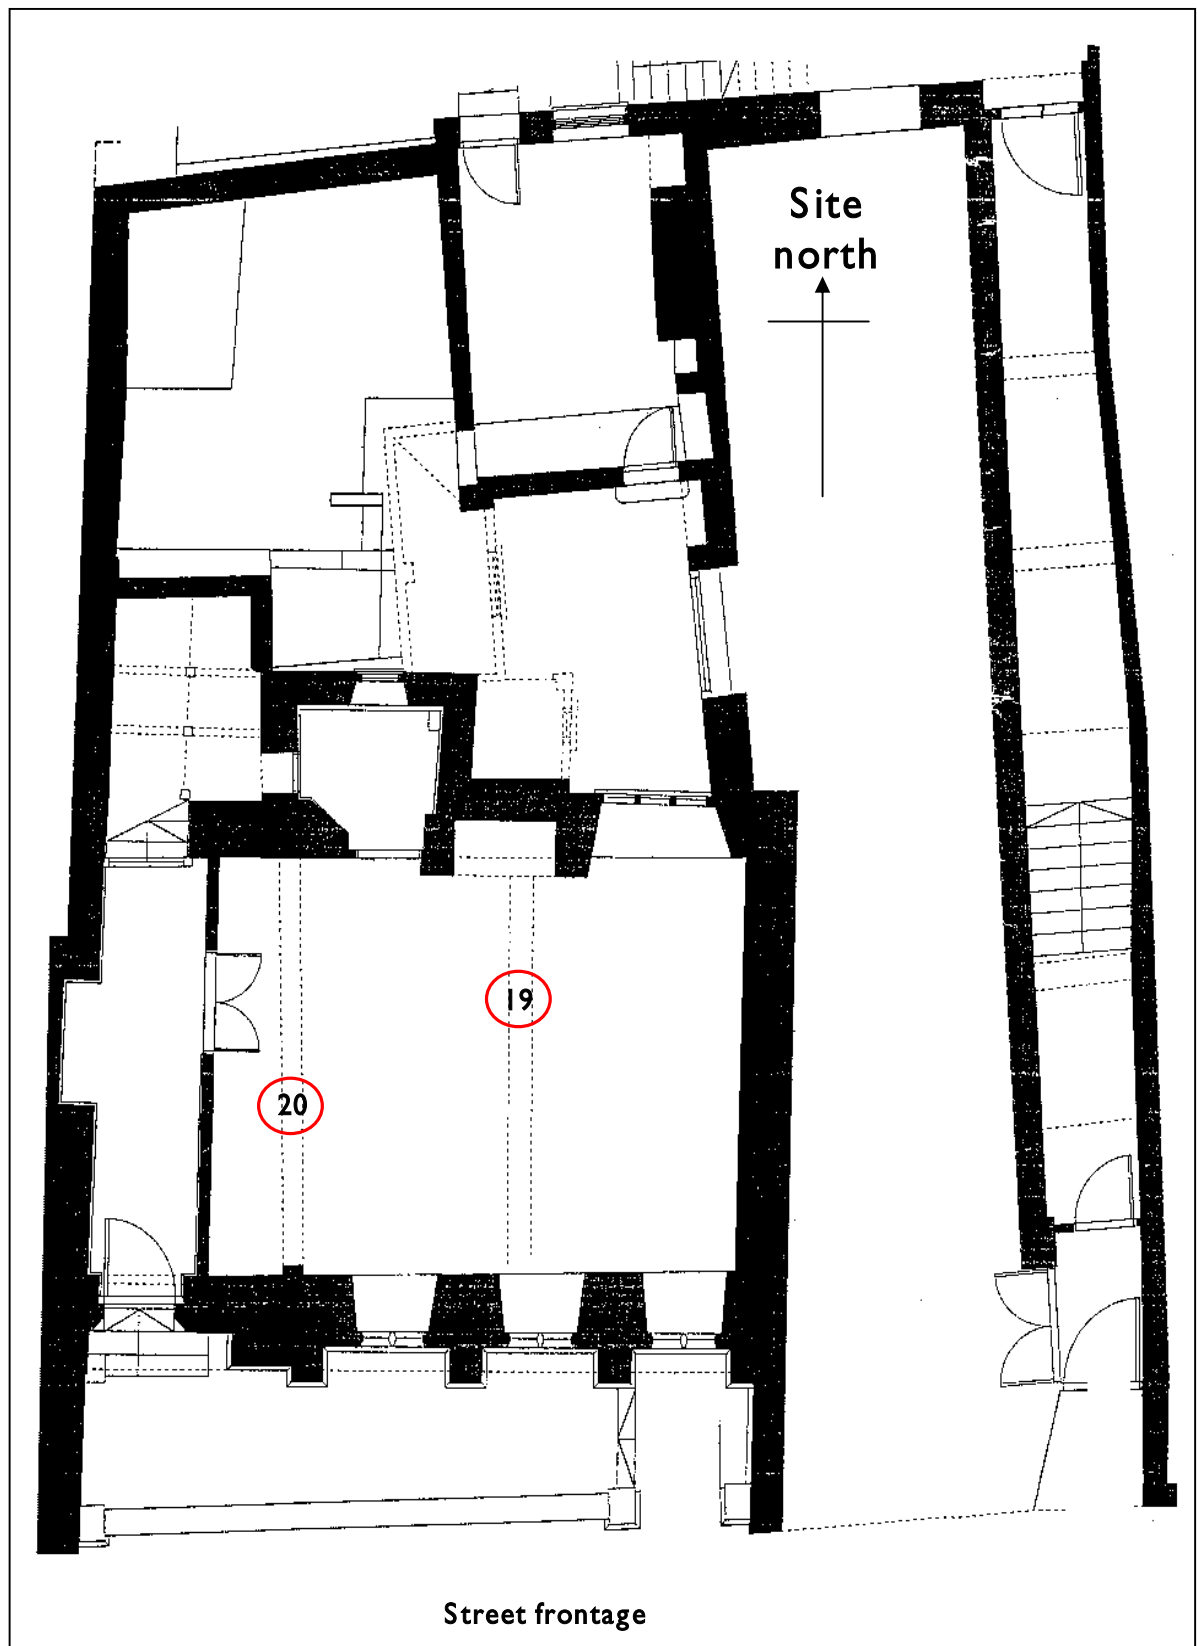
Plan to show location of samples from the ground-floor ceiling beams
